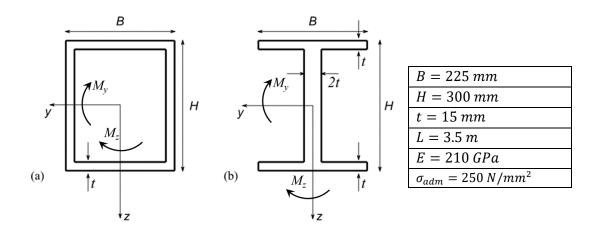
(a) Rectangular hollow section and (b) I-section for steel beam
